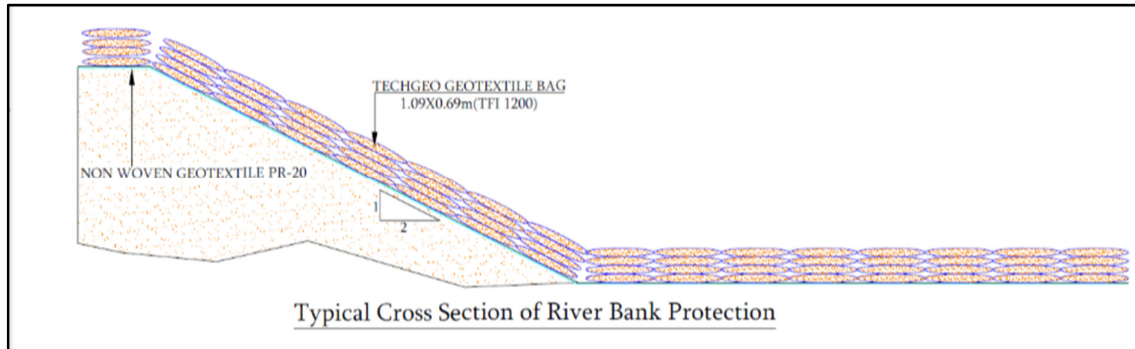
Proposed cross-section of river bank protection on the Right side of Bank
